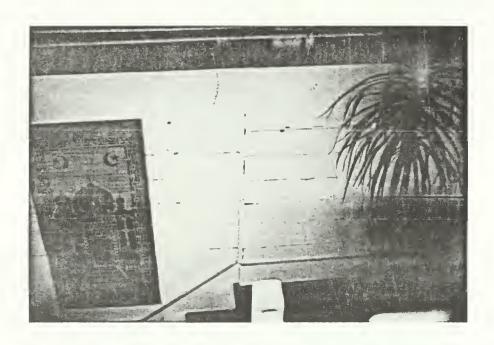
West India Goods Store, interior of first story, west wall of bay E, showing overlapped siding on stairway.
